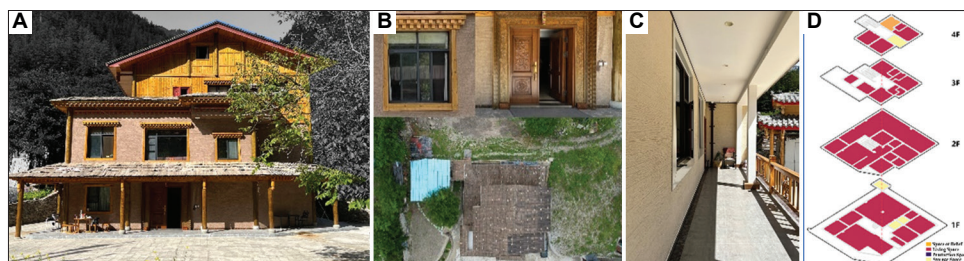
Illustration of typical dwelling features of modern dwellings. (A) Appearance; (B) construction; (C) structure; (D) floor plan showing functional zones. Source: Photos and drawing by the authors
